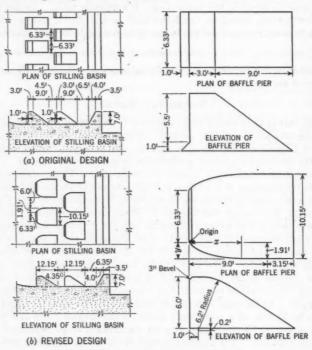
DIMENSIONS OF BAFFLE PIERS, BLUESTONE DAM
